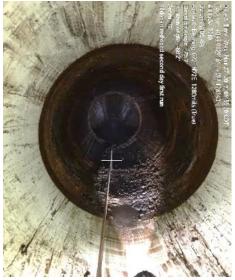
Looking into pipe from the East Chamber towards first downward deflection.
